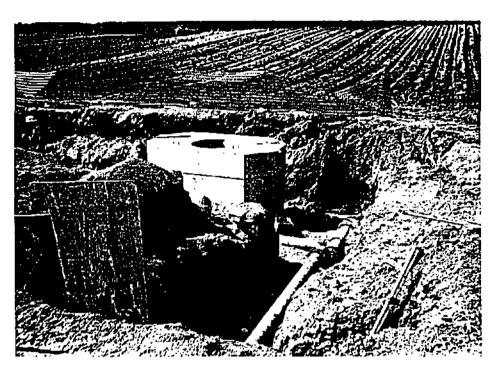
North Bloomfield, N.Y. 7/16/87. A water main connection to be the by-pass system, and a meter vault on Martin Road.
